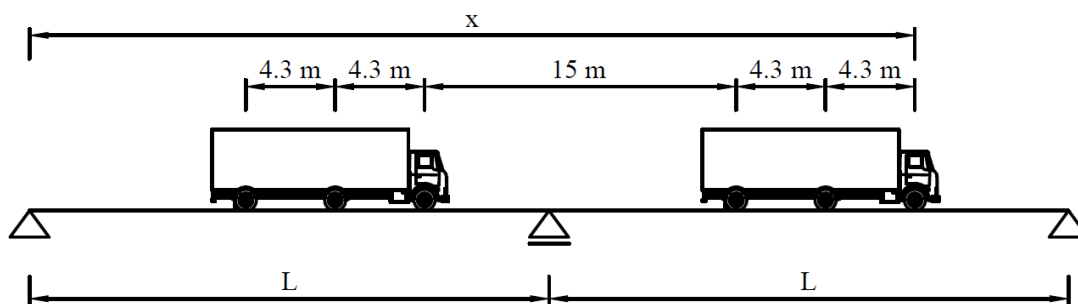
2D Structural Model and trailing trucks used for moving load analyses
